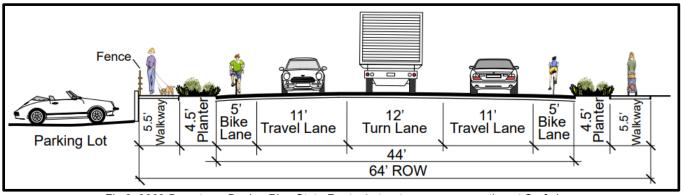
2009 Downtown Design Plan State Route 1 streetscape cross section at Surf shops.
